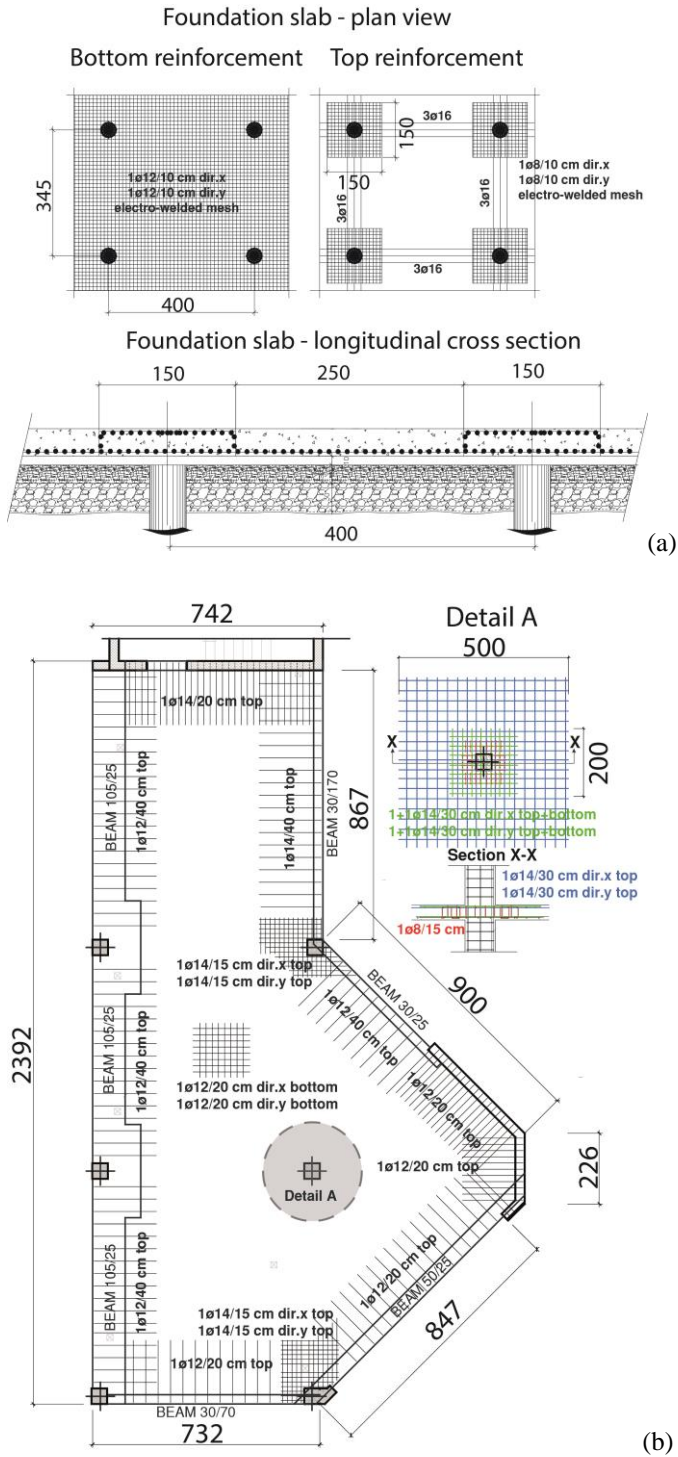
Elevated cast-on-site slabs for office zone: (a) plan view; (b) reinforcement adopted. / Piastre di solaio gettate in opera per la zona uffici: vista in pianta; (b) schema d'armatura.
